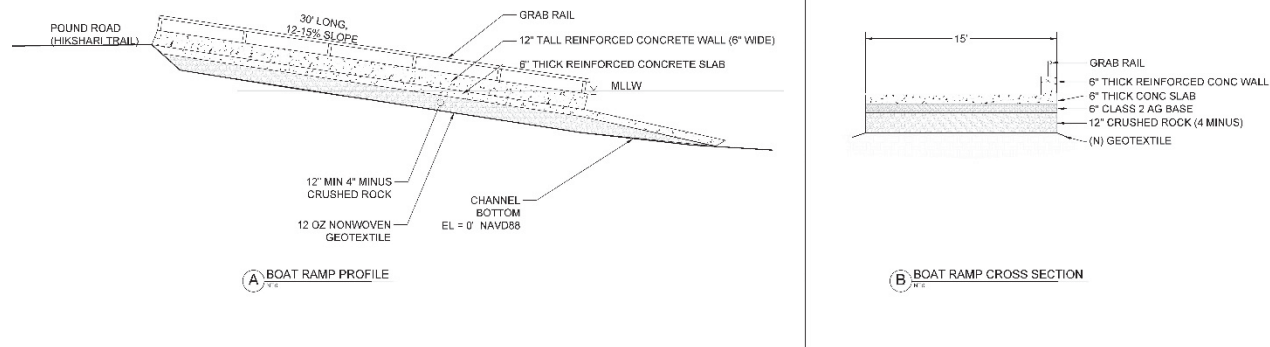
The Area 1 boat ramp will use a concrete slab or a similar material (Appendix A, Sheet C-16).
